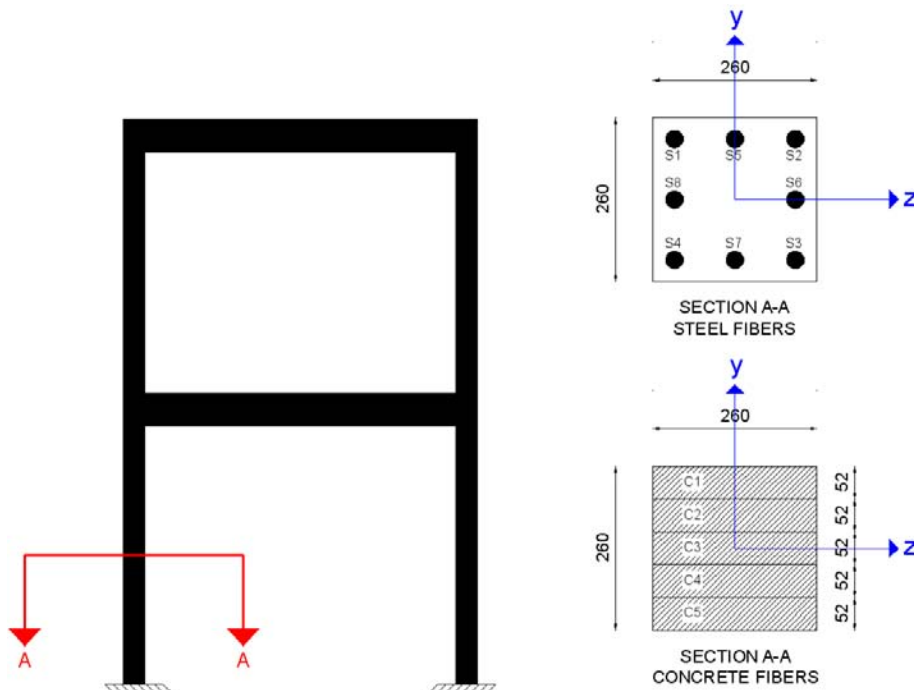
Fibers cross section for 1<sup>st</sup> floor columns in both bare frame and CFRP retrofitted frame
